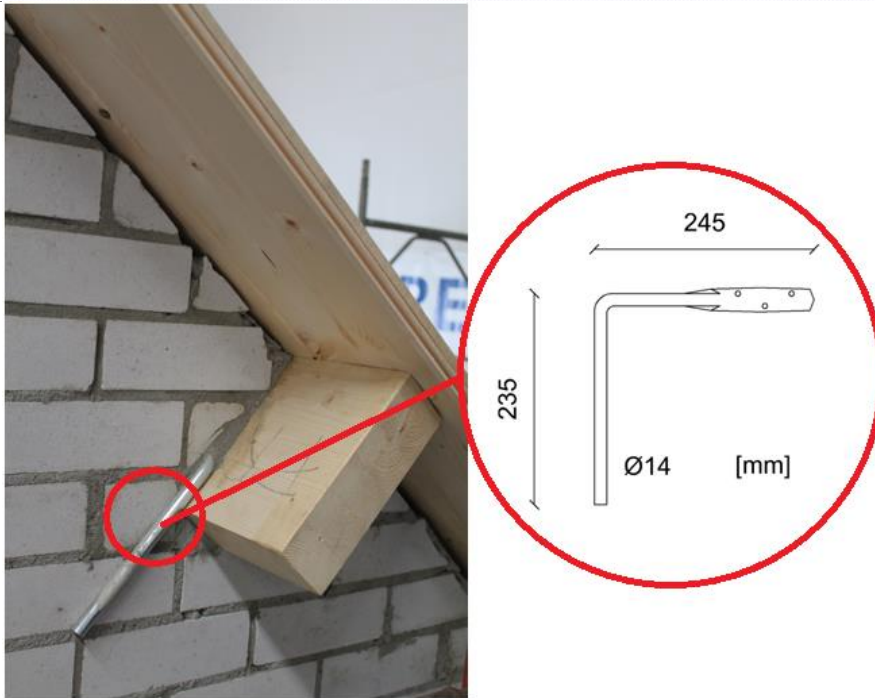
Roof and c.s. gable - South side - detail of the connection with the steel tie
